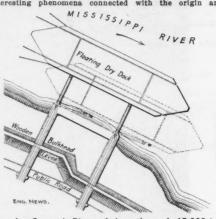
General Plan of Location of 15,000-ton Floating Dry Dock at Algiers, La.
